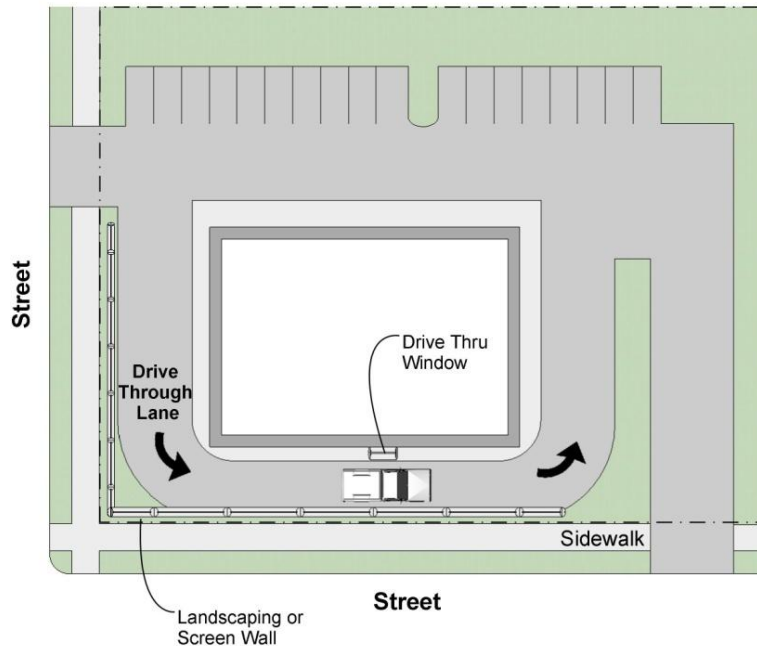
Suburban Context - Landscaping or Screen Wall and Drive-Through Location; 17.7.6.2:C.1
